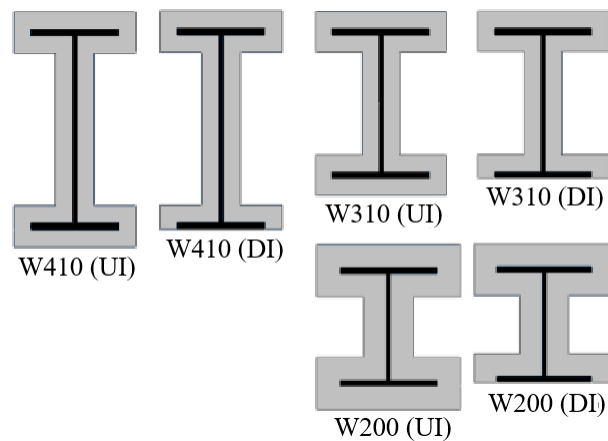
Cross-sections of segments with damaged insulation (DI) and undamaged insulation (UI)
